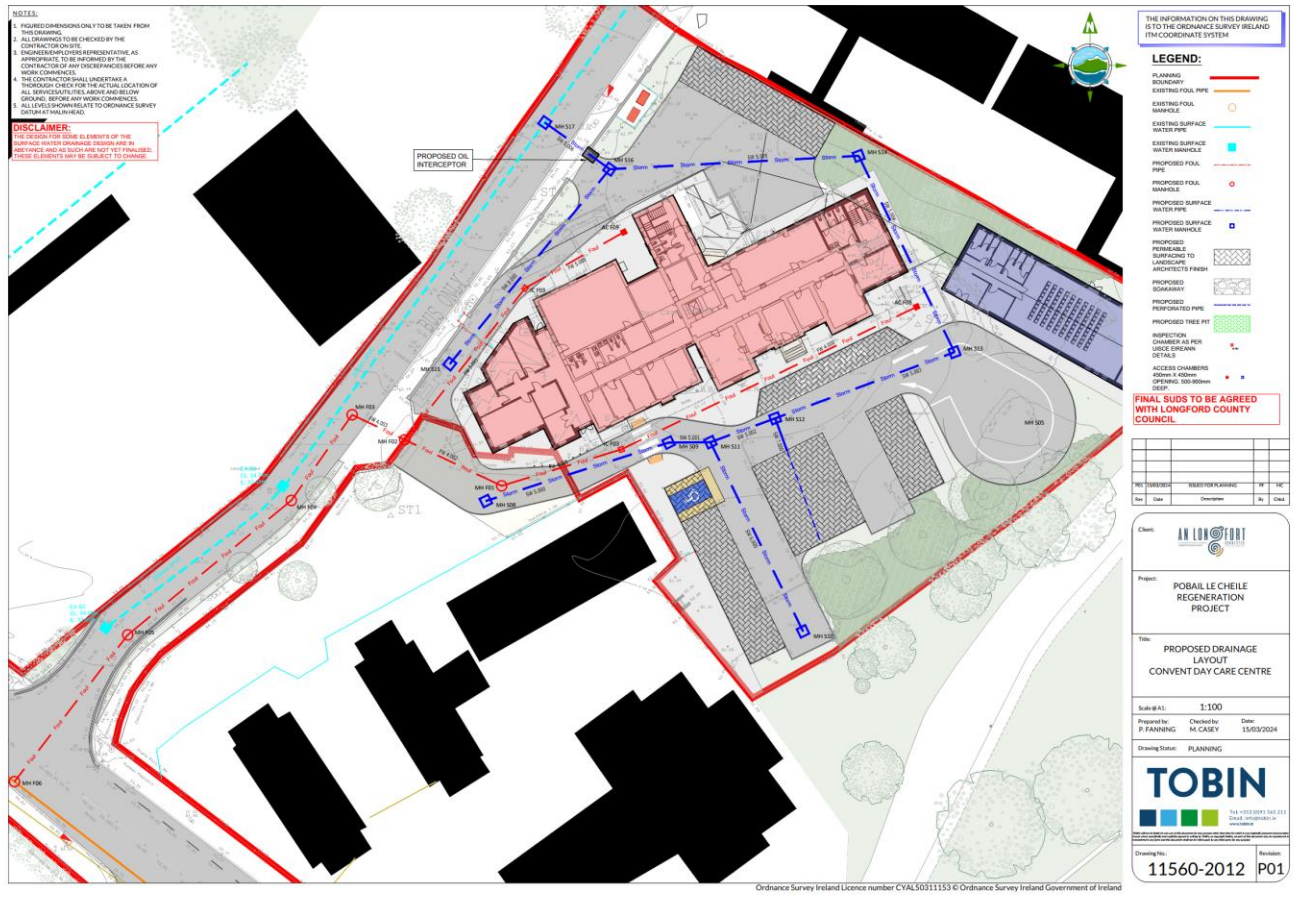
Proposed Convent Drainage, drawing 11560-2012
